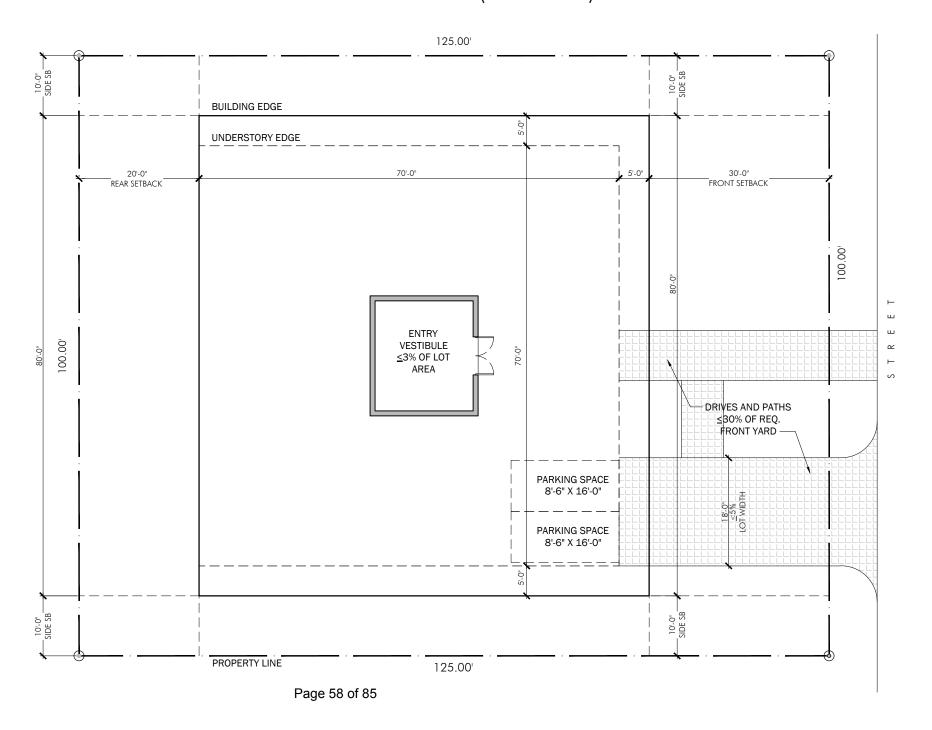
EXHIBIT B: PROPOSED CONDITION 100' LOT (SECTION)
